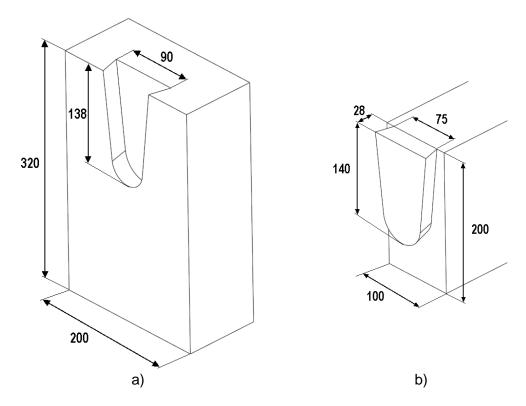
a) Carved mortise in the beam and b) Tenon of the RDC. (Dimensions in mm)
